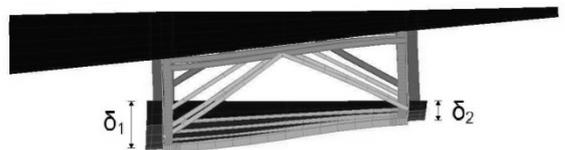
Deformed deck shape due to an asymmetric train load – alternative C
